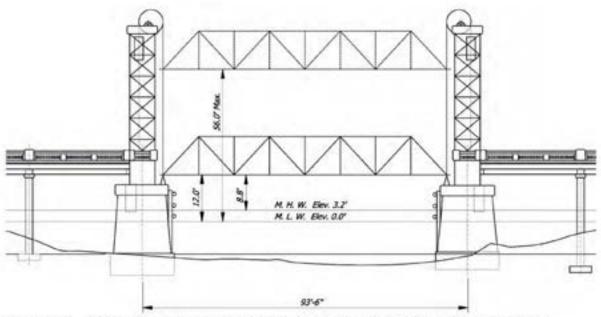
Bridge elevation view for a vertical lift bridge indicating vertical clearances. (Source: Florida DOT)
